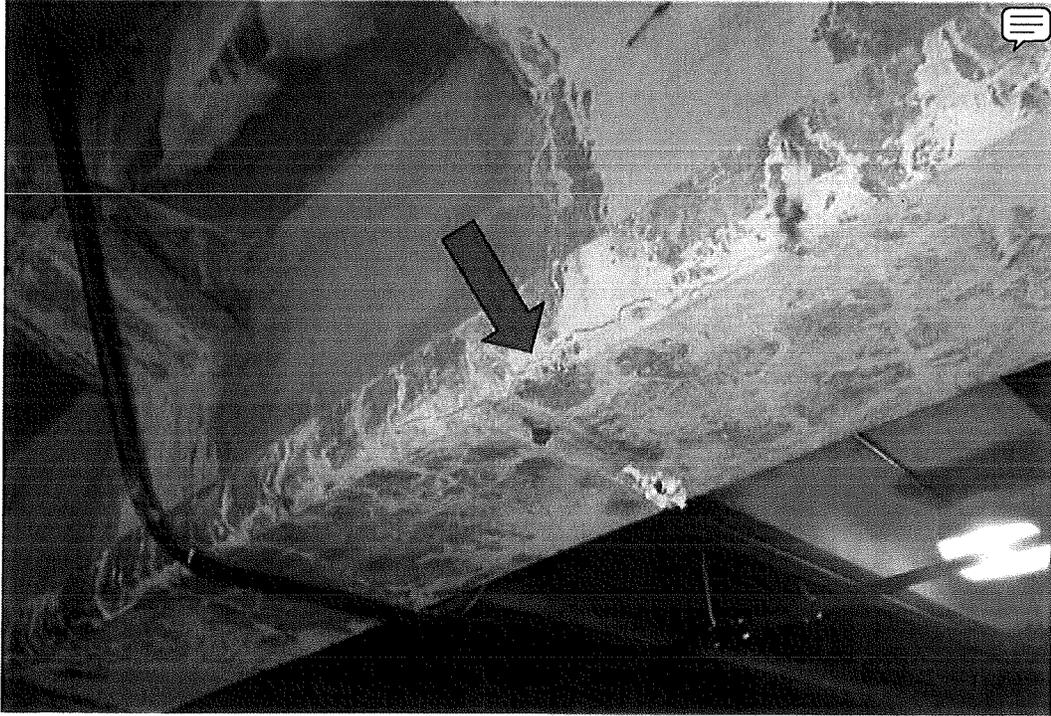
Cracked and hollow sounding encasement. Between Column Lines 15-17, along Column Line U1 at the underside of Car Parking Level 7. (Approx. 6 SF)
